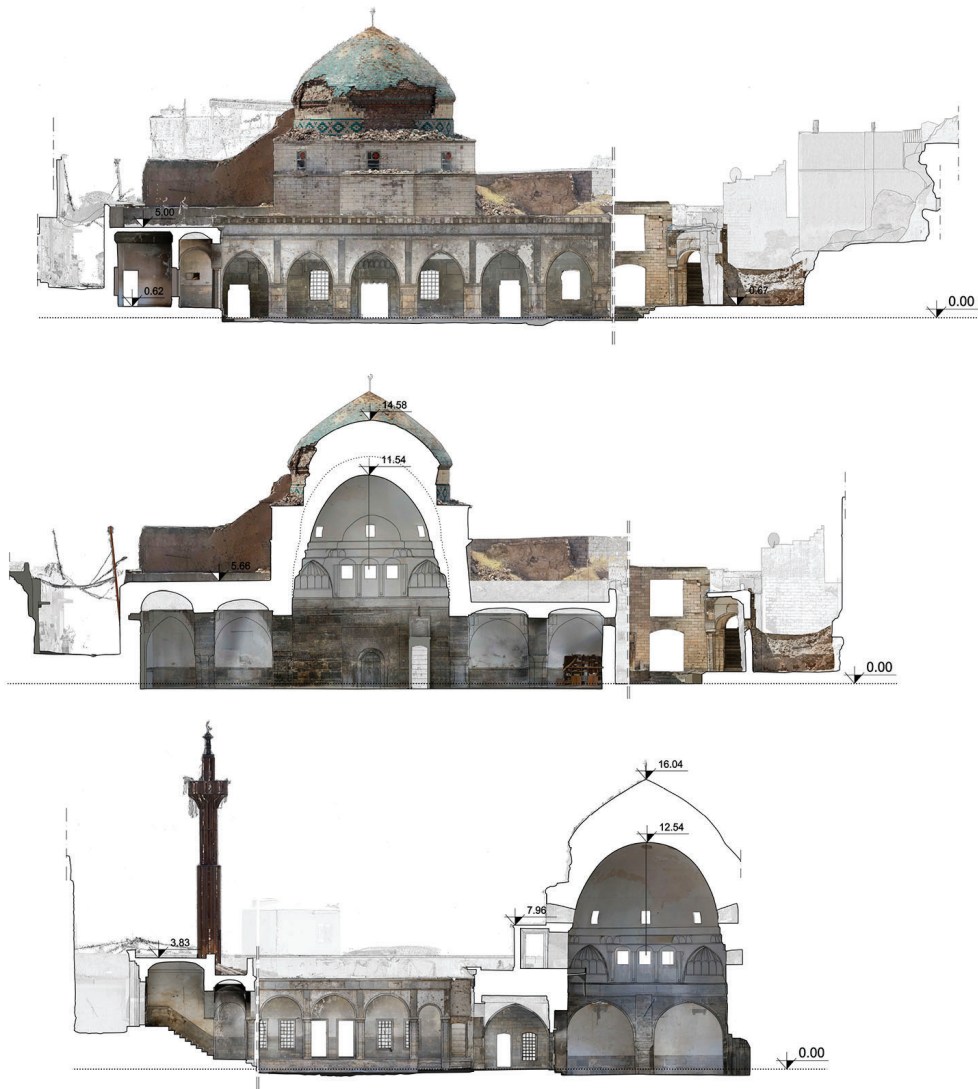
Elevations and sections drawing, showing the architectural state of conservation of the building.
